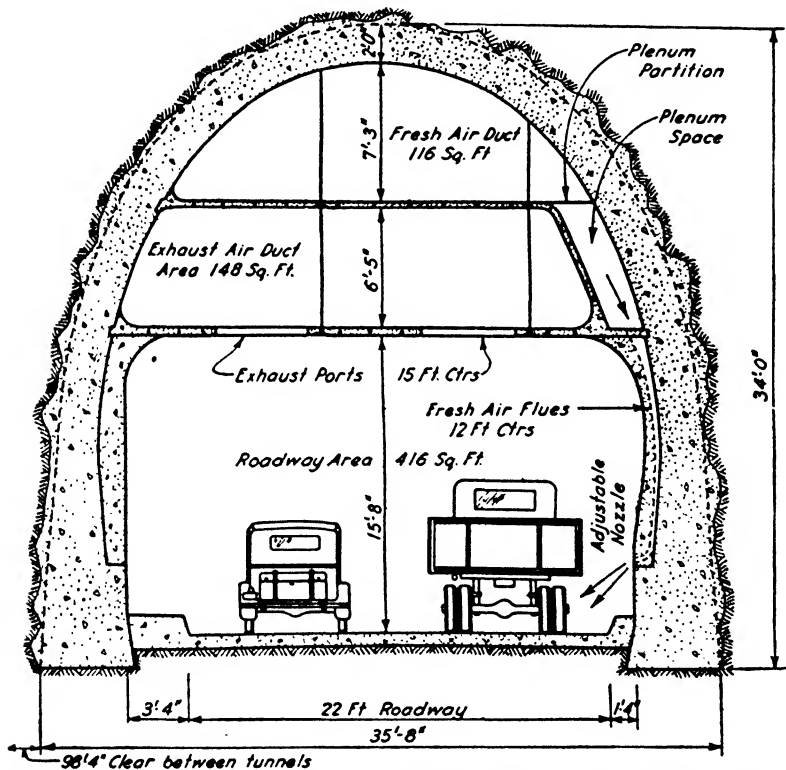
Broadway Low Level Tunnel, Oakland, Calif. Note unusual arrangement of ventilation ducts. (From "Western Construction News.")
